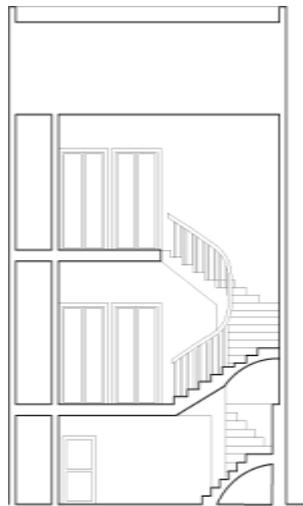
BB' section of the house at 117 lot 6 parcel
